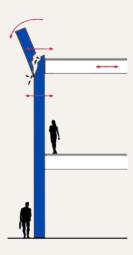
Unbraced URM parapets can break free of the building and fall to the street below.
